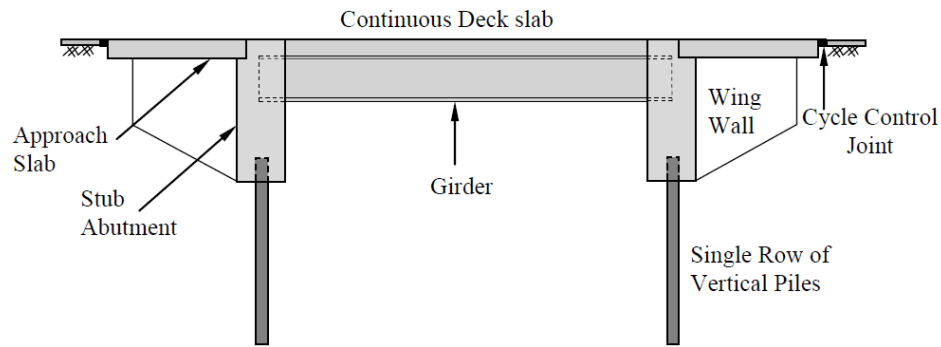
Schematic of a typical Integral Abutment Bridge
